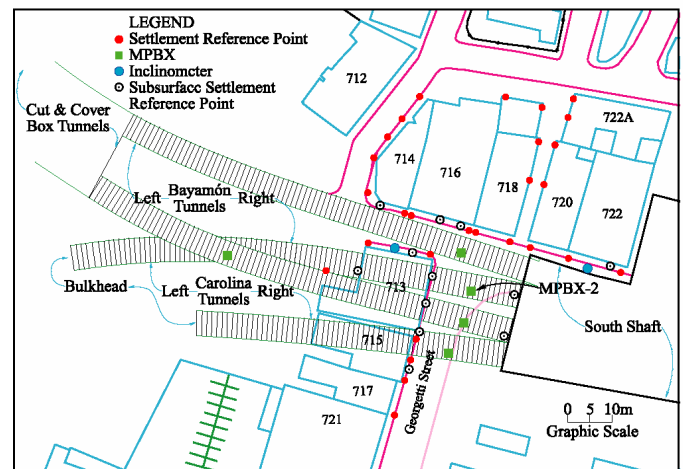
Plan Showing Tunnels and Geotechnical Instrumentation
